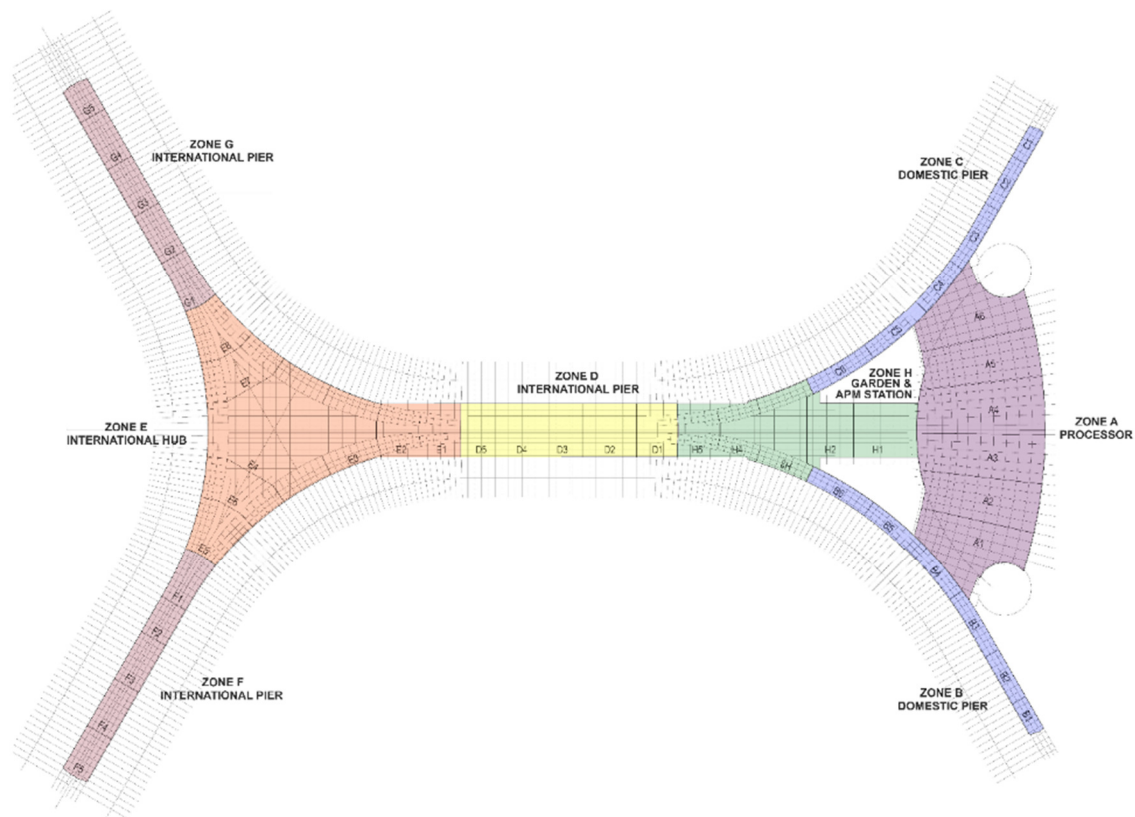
Plan of Passenger Terminal Building (PTB) showing its zones.
